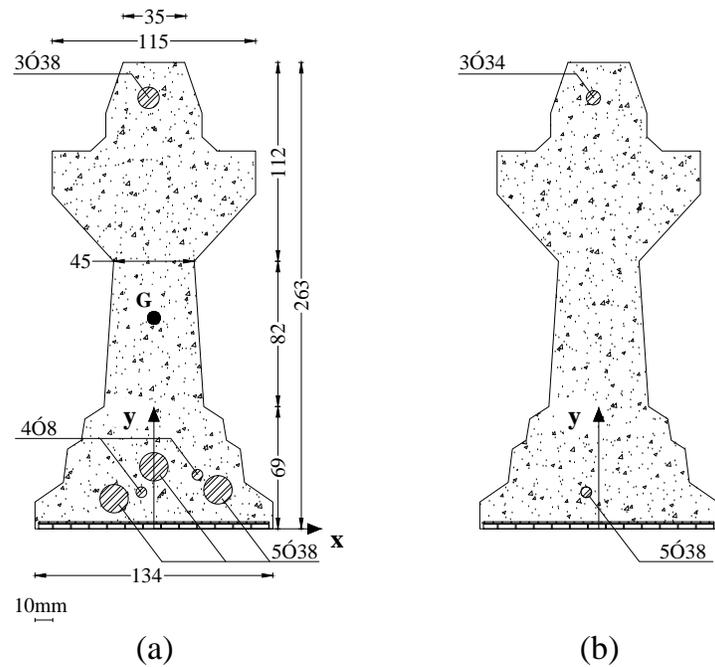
Concrete beam mid-span (a) and beam end (b) cross-sections (clay tile at the bottom) and reference system
